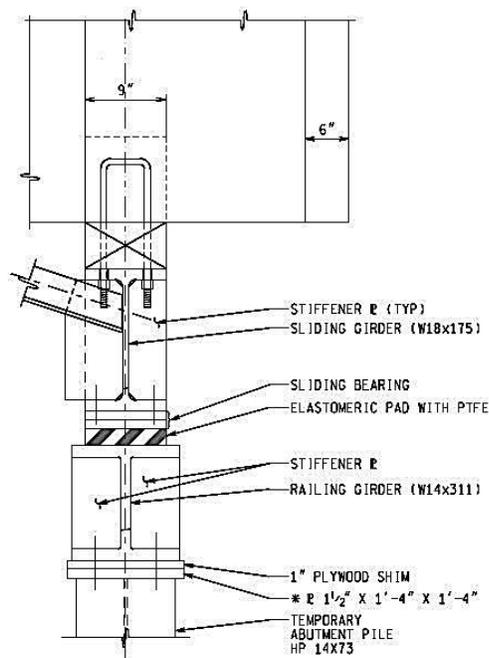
End view of the US-131 NB and SB bridge temporary substructure
